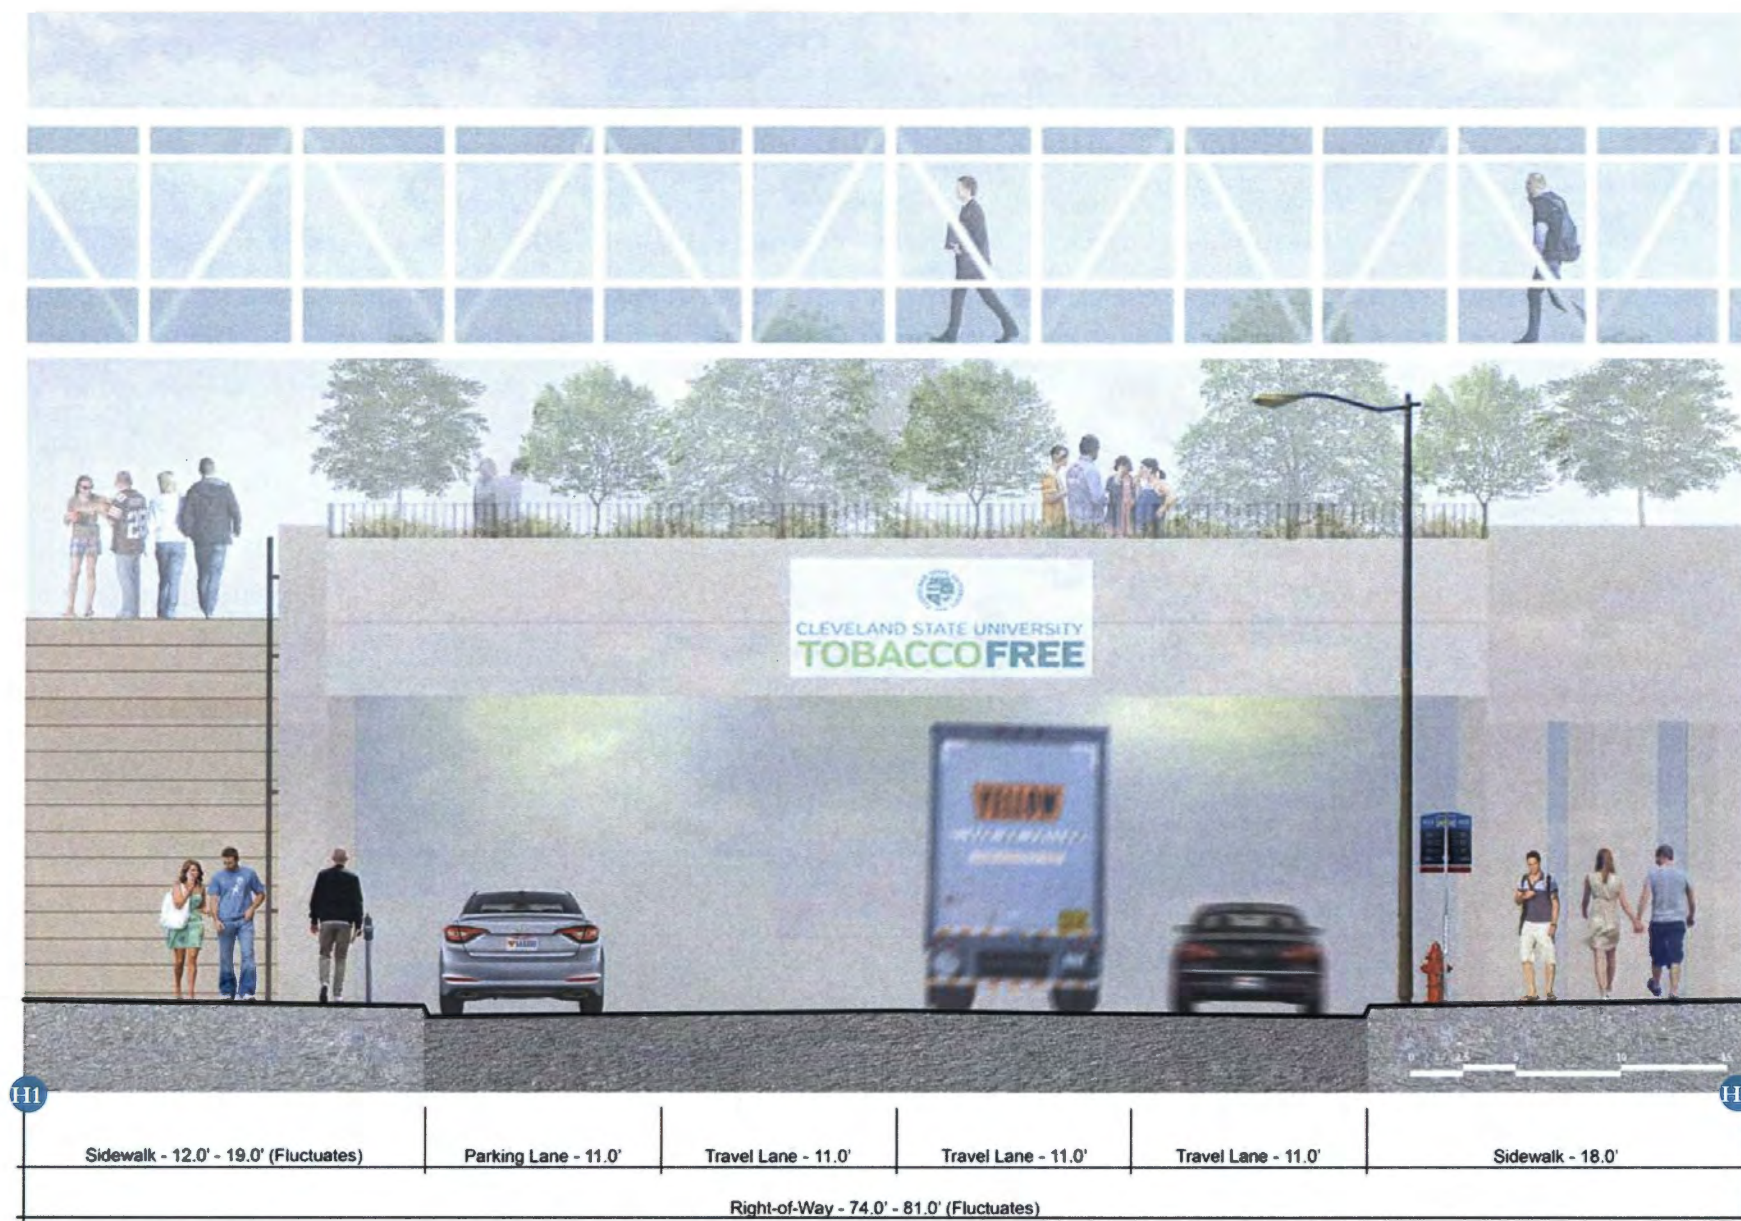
East 22nd Street between Euclid Avenue and Chester Avenue Existing Section
